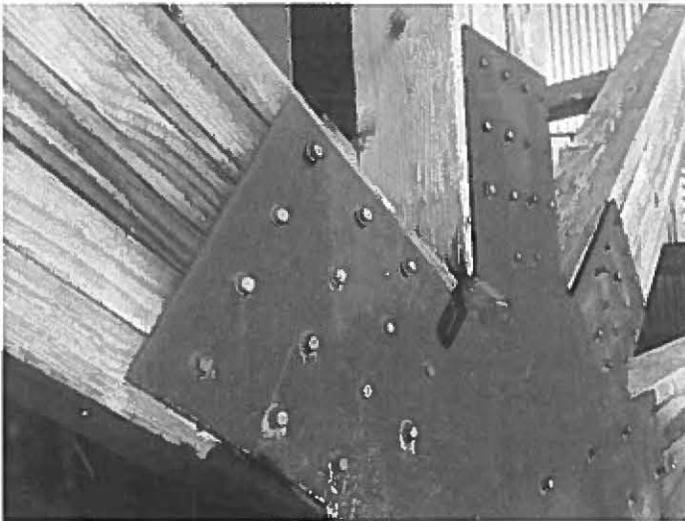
Typical side plate connection. $\frac{1}{4}$ " thick painted steel fastened with wood screws. This photo is of the intersection of the outer truss bottom chord with the king post and webs. The screws are rusted and some are loose. The plate is also loose. Note how the acute angles formed by the intersecting timbers are facing up and form a trough which can collect and hold water. Note also that the screwdriver bottoms out in rotted area behind side plate. Other side plate connections are in similar condition.
